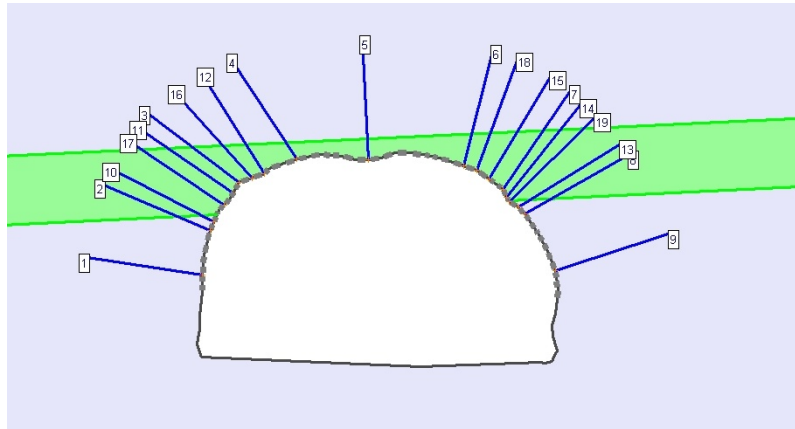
Rock bolt setup, additional rock bolts (16-19).
